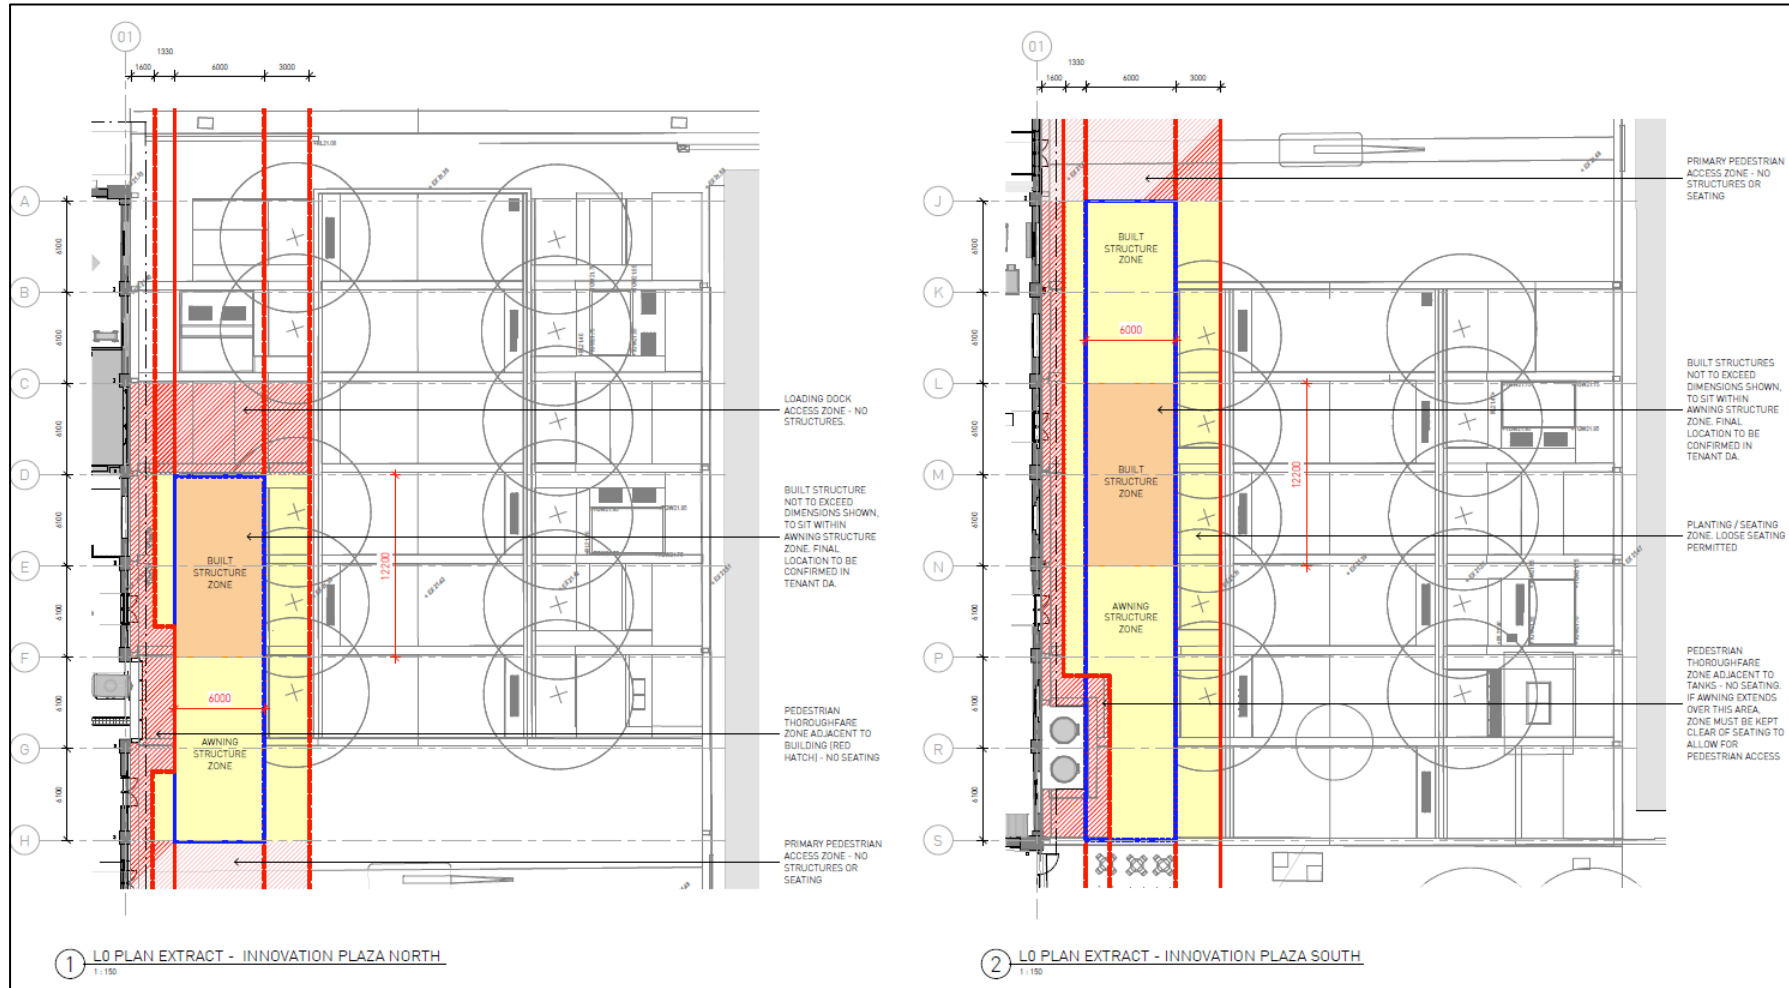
Innovation Plaza Built Structure and Awning Structure Zones
